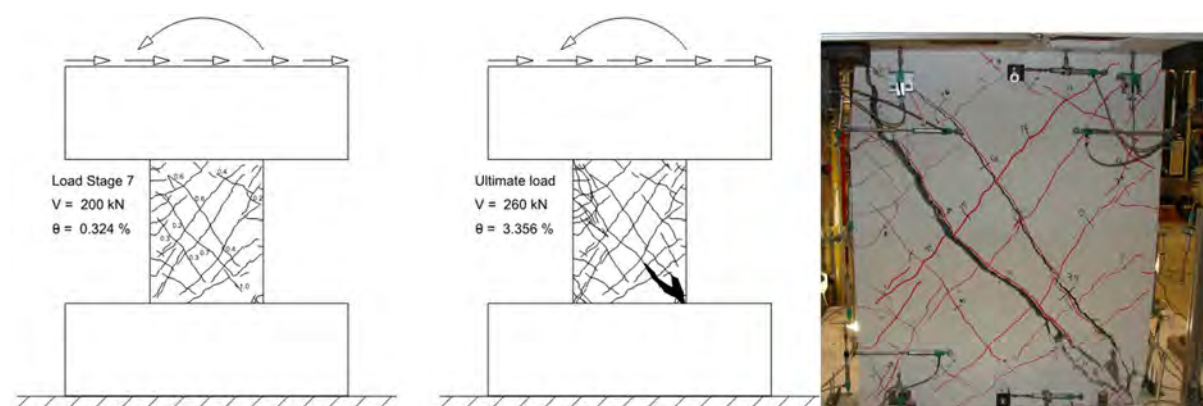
Crack diagrams of specimen RB4: at Load Stage 7 (left) and failure (middle). RB4 specimen's post-test photo (right)
